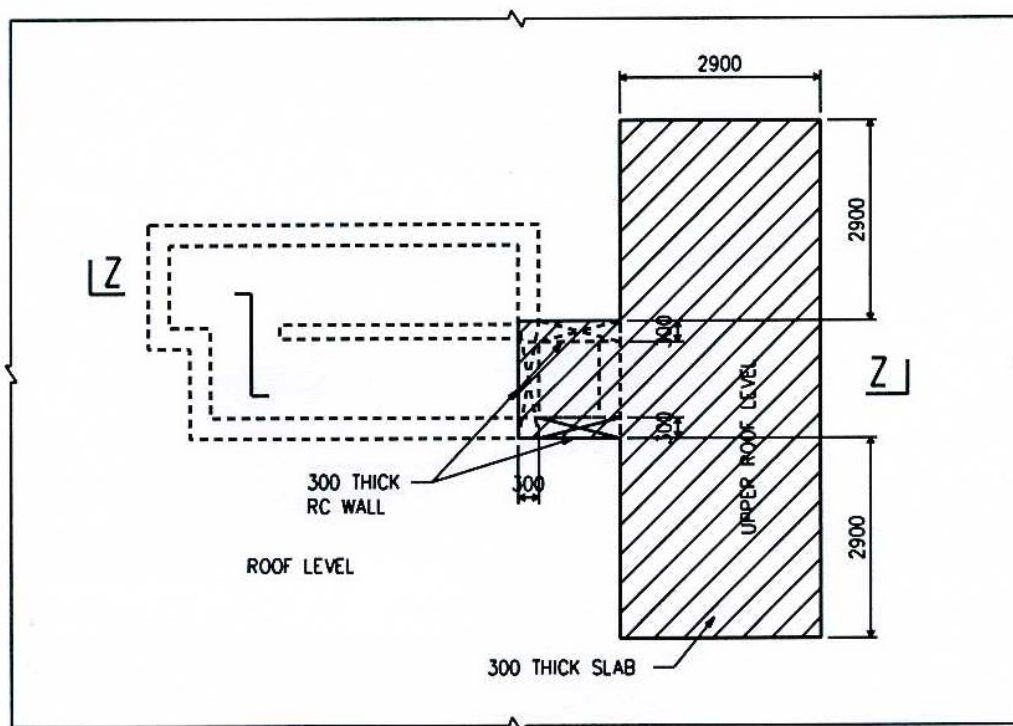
(a-6) PLAN OF STAIRCASE STOREY SHELTER AT UPPER ROOF LEVEL
